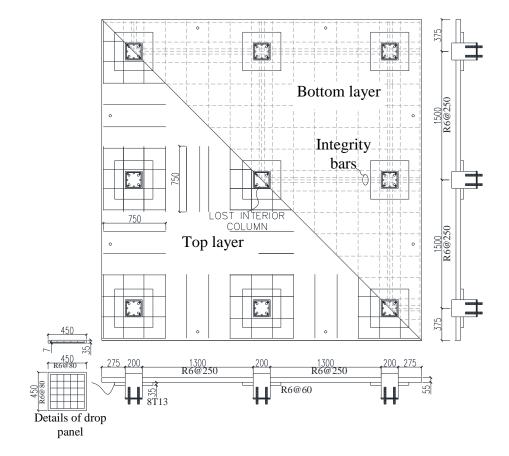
Dimension and reinforcement details of Specimen WD (unit: in mm)
